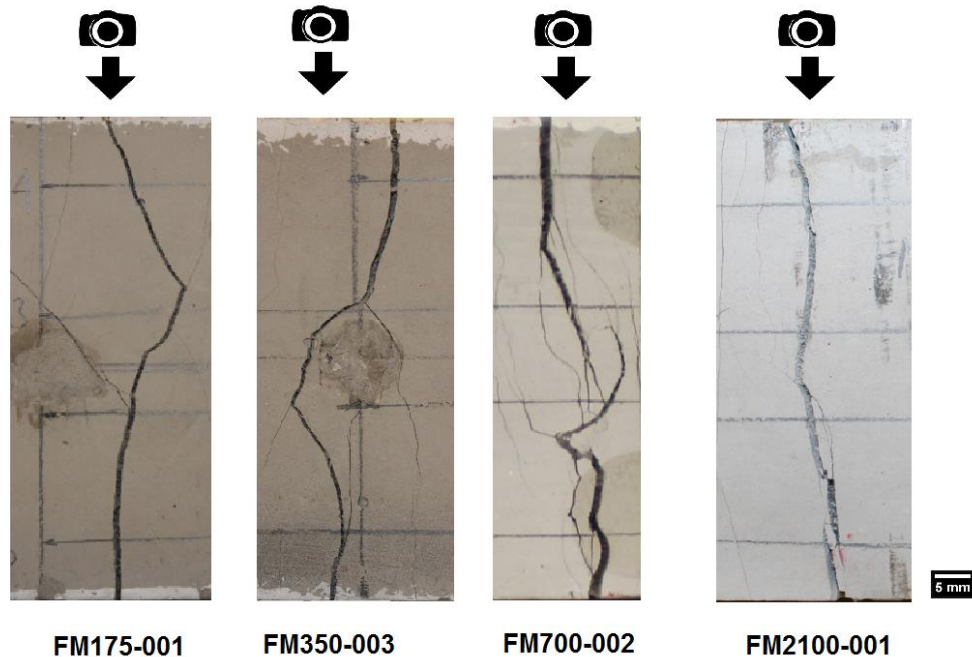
Crack pattern viewed from bottom of the specimens. Arrow gives side of camera surface in DIC.
